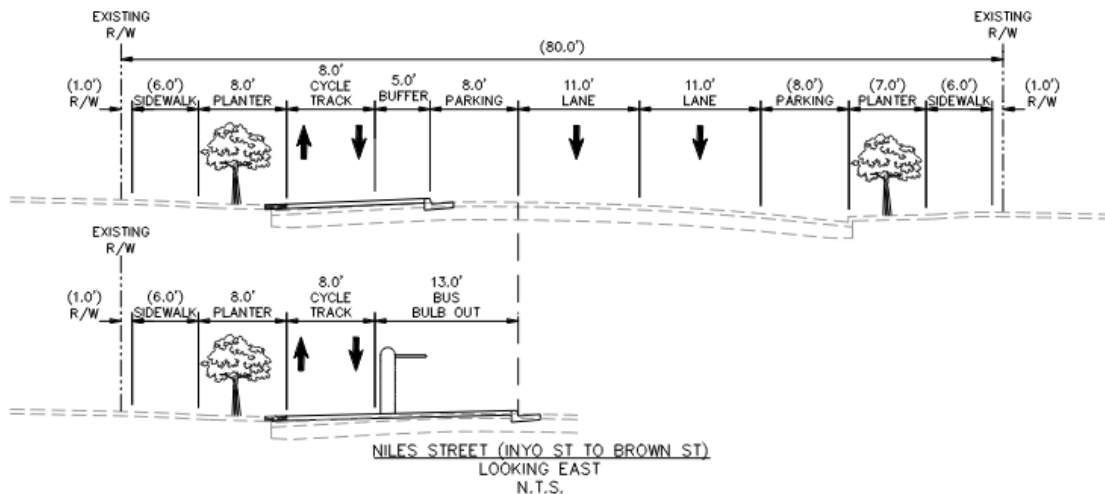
Proposed Cross Section - Niles Street (Inyo St to Brown St)
